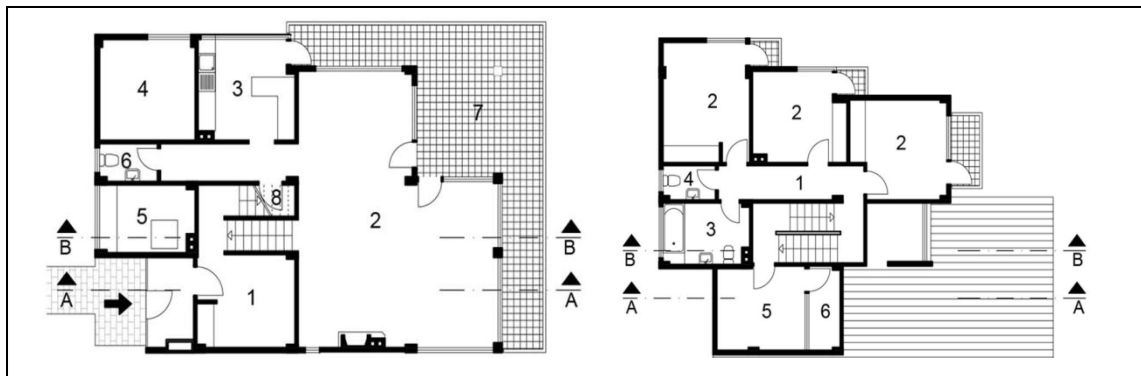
Floor plans of Hatice Musa Çapın villas [90]
